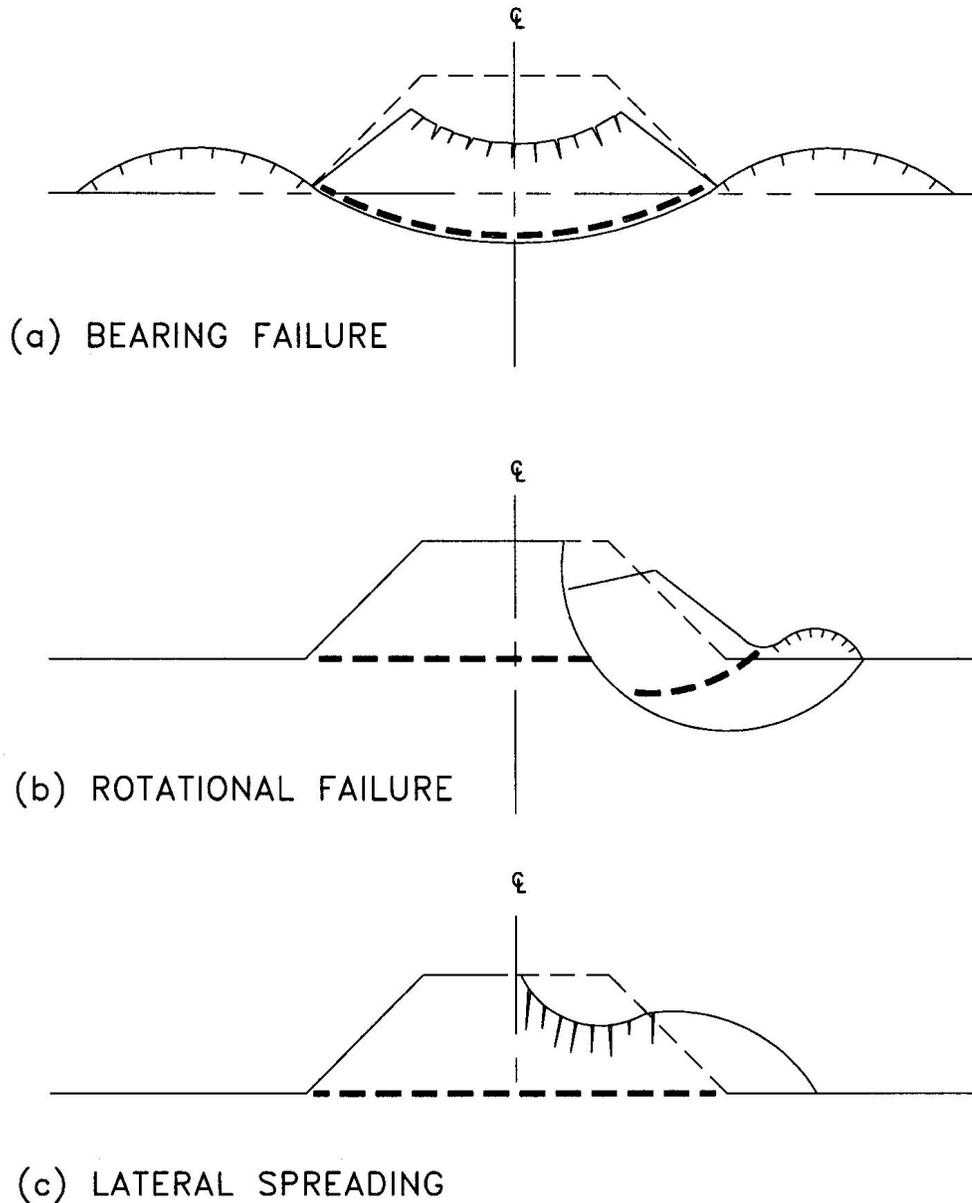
Reinforced embankments failure modes (after Haliburton et al., 1978b).
